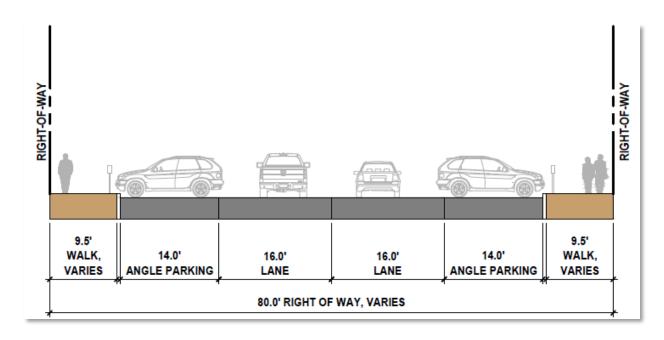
5th St - Existing Cross-Sections Between Colorado Ave & Main St & Main St to Rood Ave
